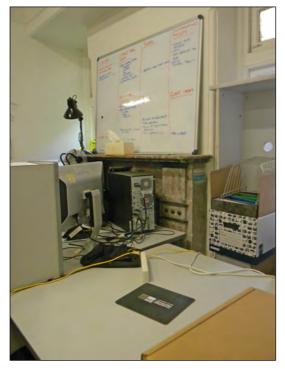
Fireplace in Area 5B, southern wall. Figure 70: Windows in Area 5C, southern wall.
